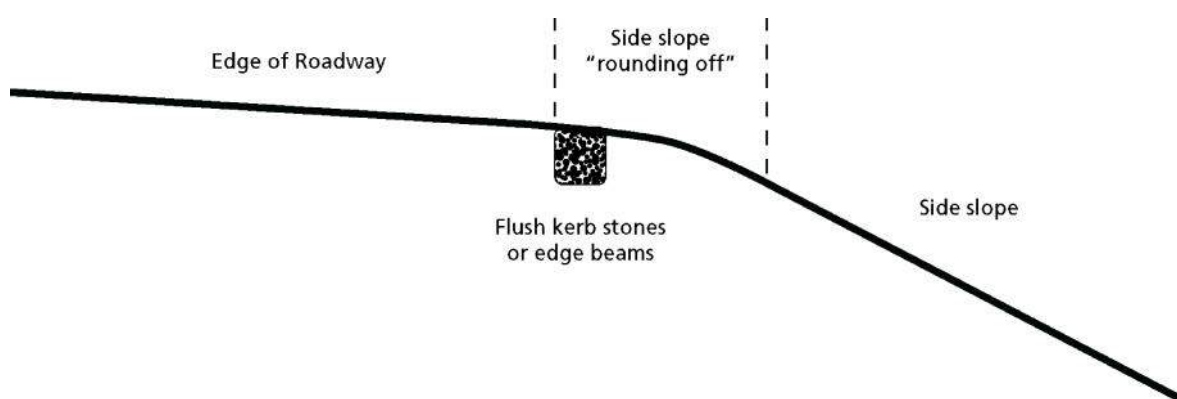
Side slope “rounding off” and location of flush kerb stones or edge beams
